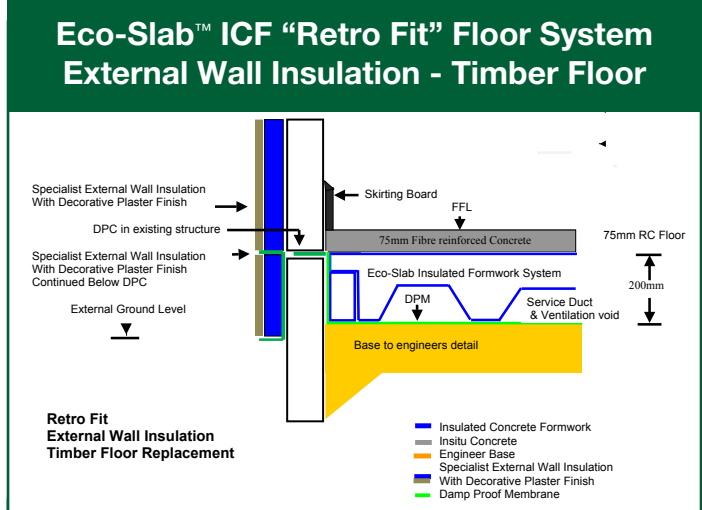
Illustrates how removing an existing timber floor will reveal a void or crawl space. This is filled to engineers detail to leave a regular & even surface for installing the Eco-Slab™ system. (An economical option for this would be foam concrete).
